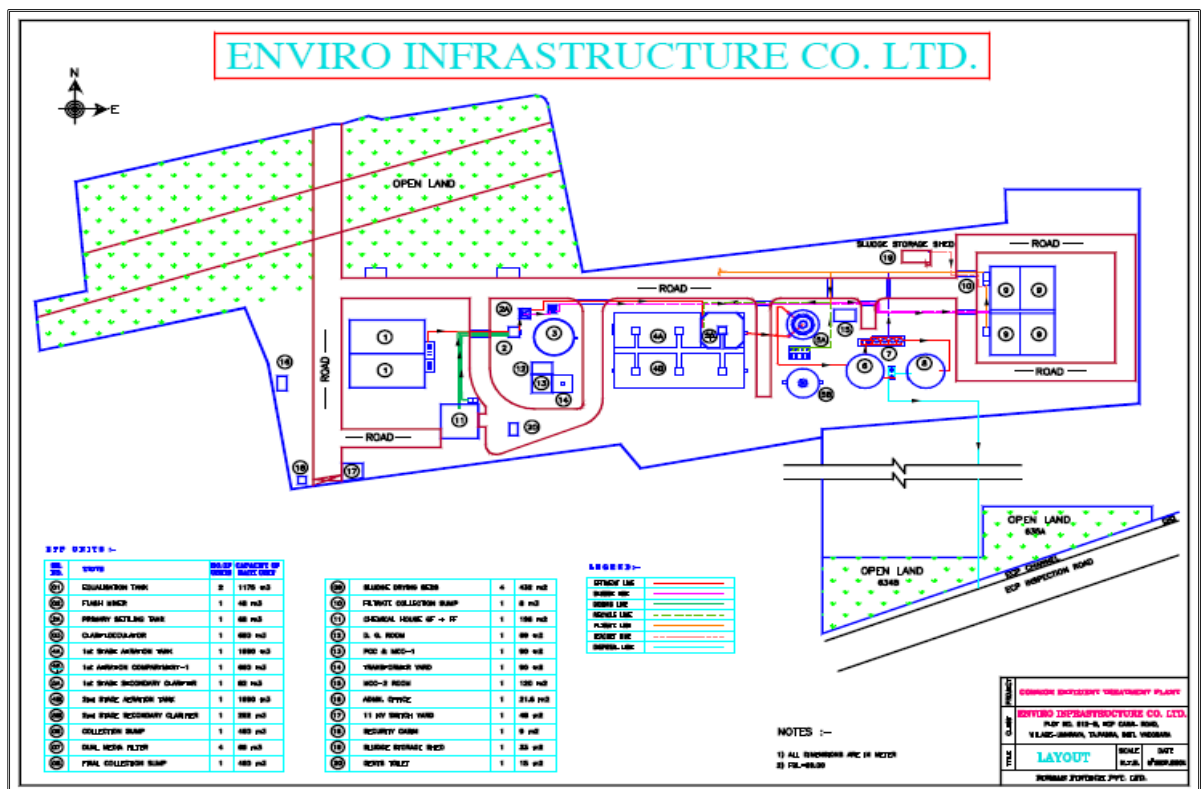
Layout Plan Of Enviro Infrastructure Pvt. Ltd.
